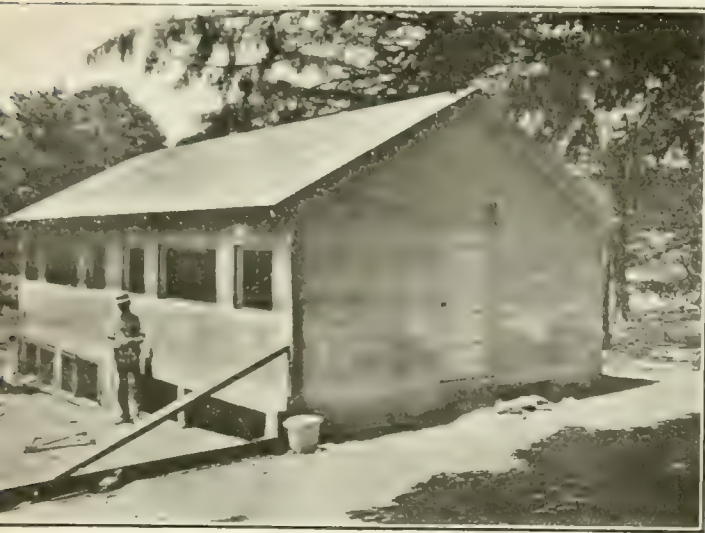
A concrete poultry house. This building rests on concrete piers and has a concrete floor, partition and walls. The walls are only 4 inches thick.
